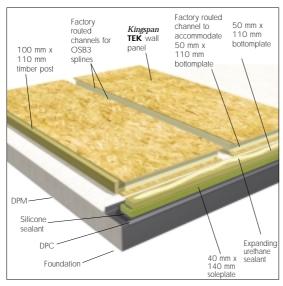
ENSURE WALL PANELS ARE LAID FLAT
